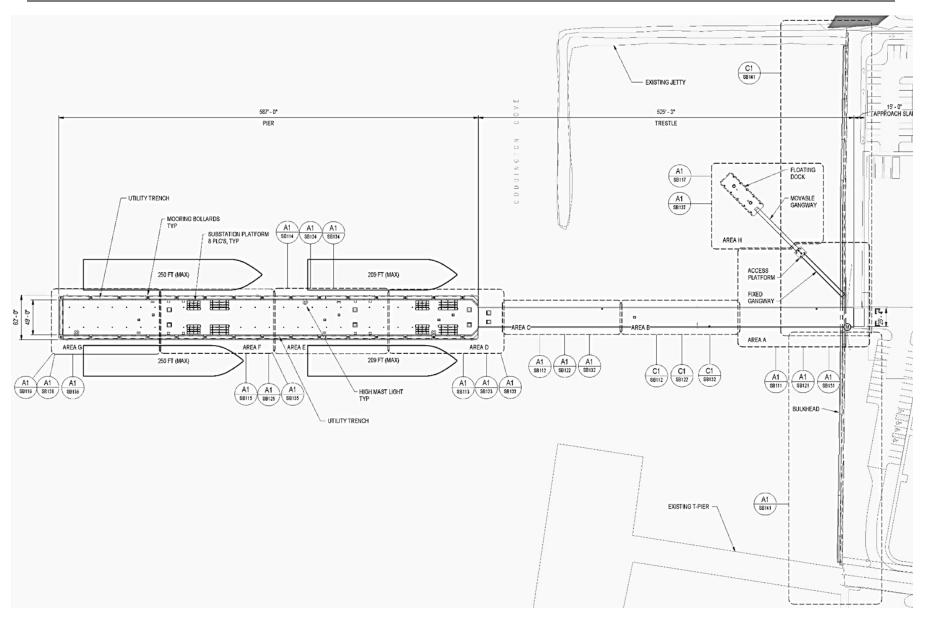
Plan View of Pier, Trestle, Floating Dock, and Bulkhead (Proposed Action)
